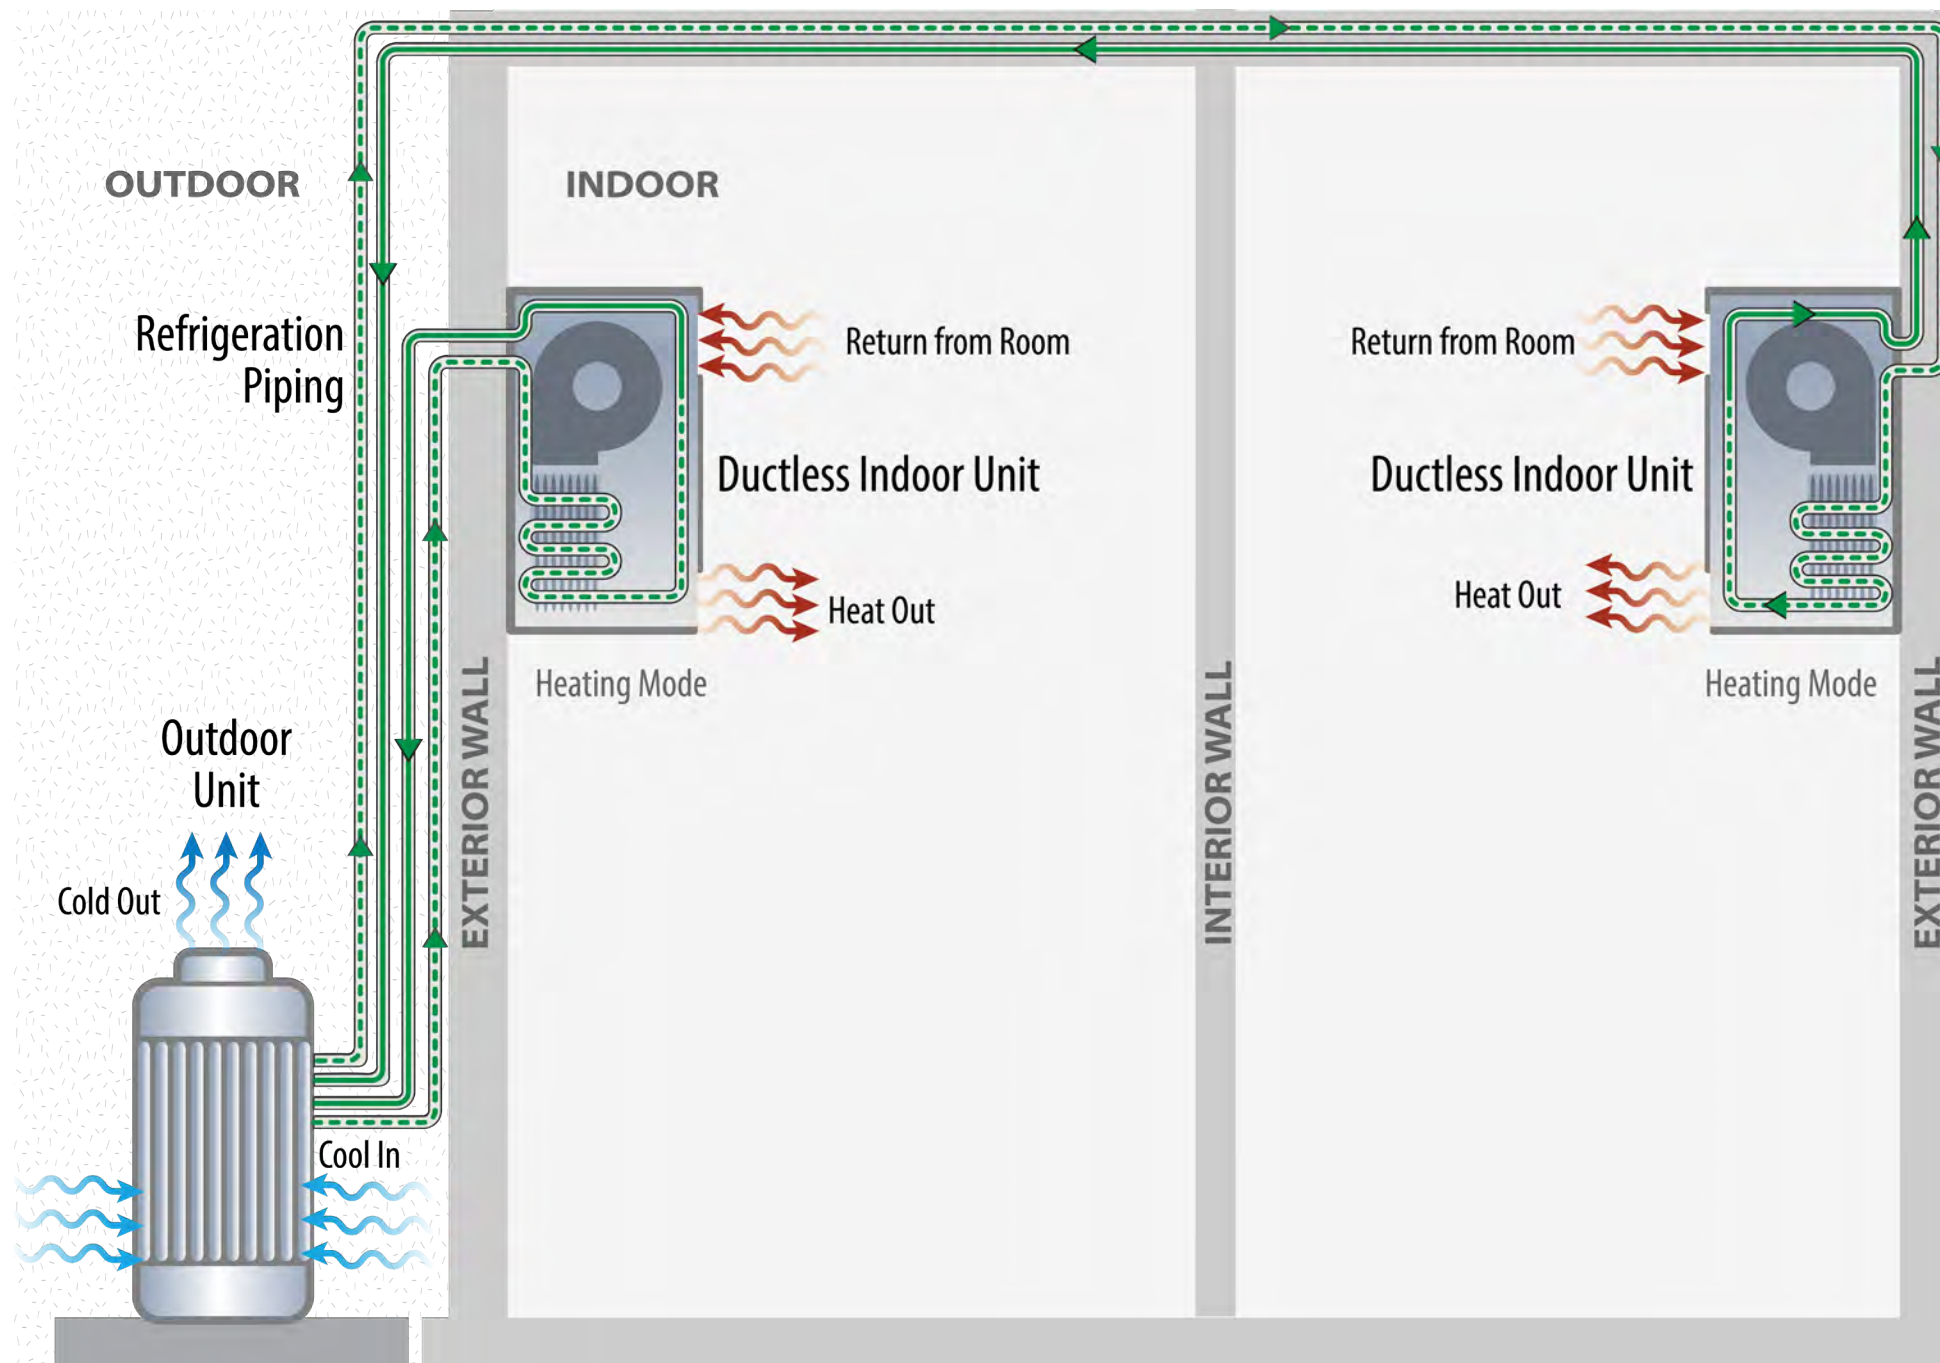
Ductless split air-to-air heat pump and component-level placement in a building in heating mode¹
